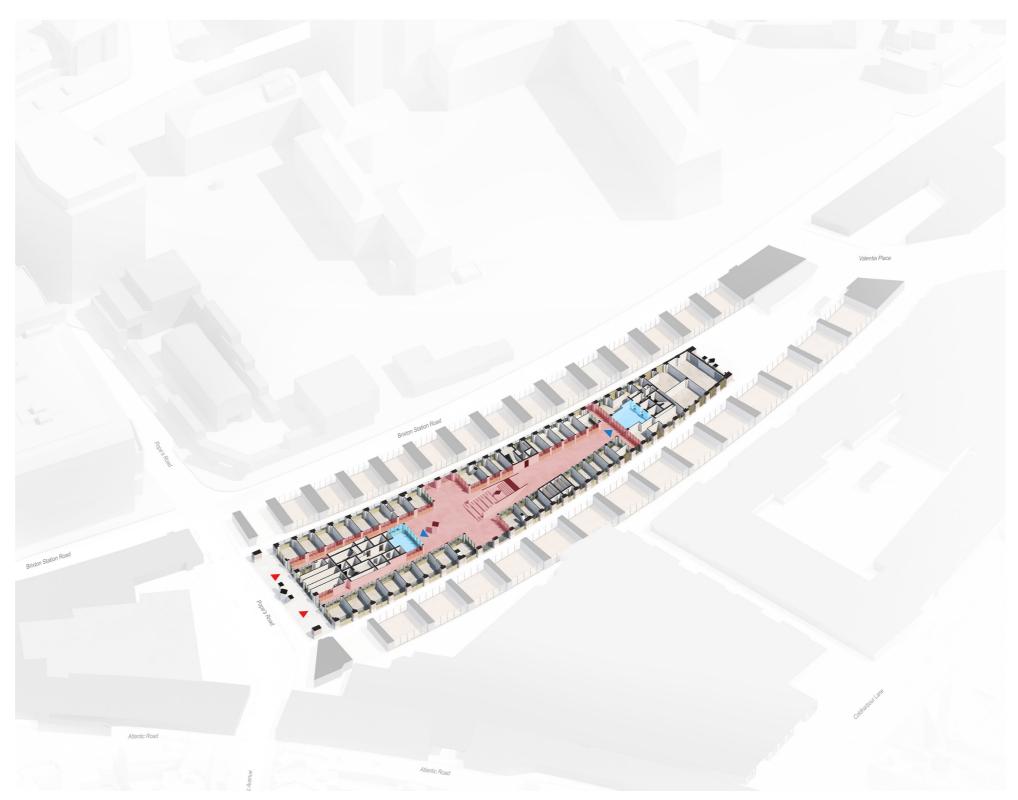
Ground floor axonometric diagram - pedestrian access
